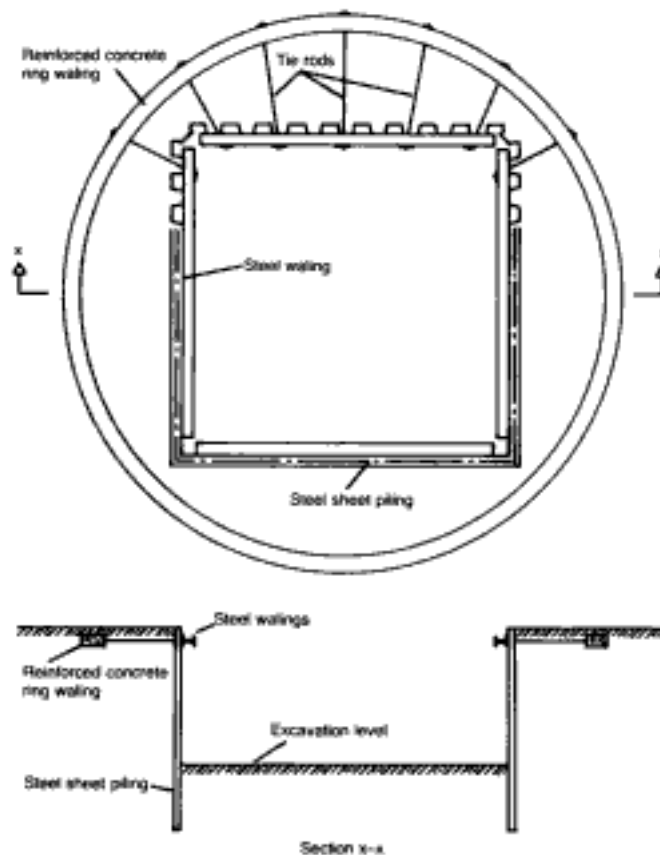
Square sheet piled cofferdam anchored to outer circumscribing reinforced concrete ring waling (Packshaw¹)
